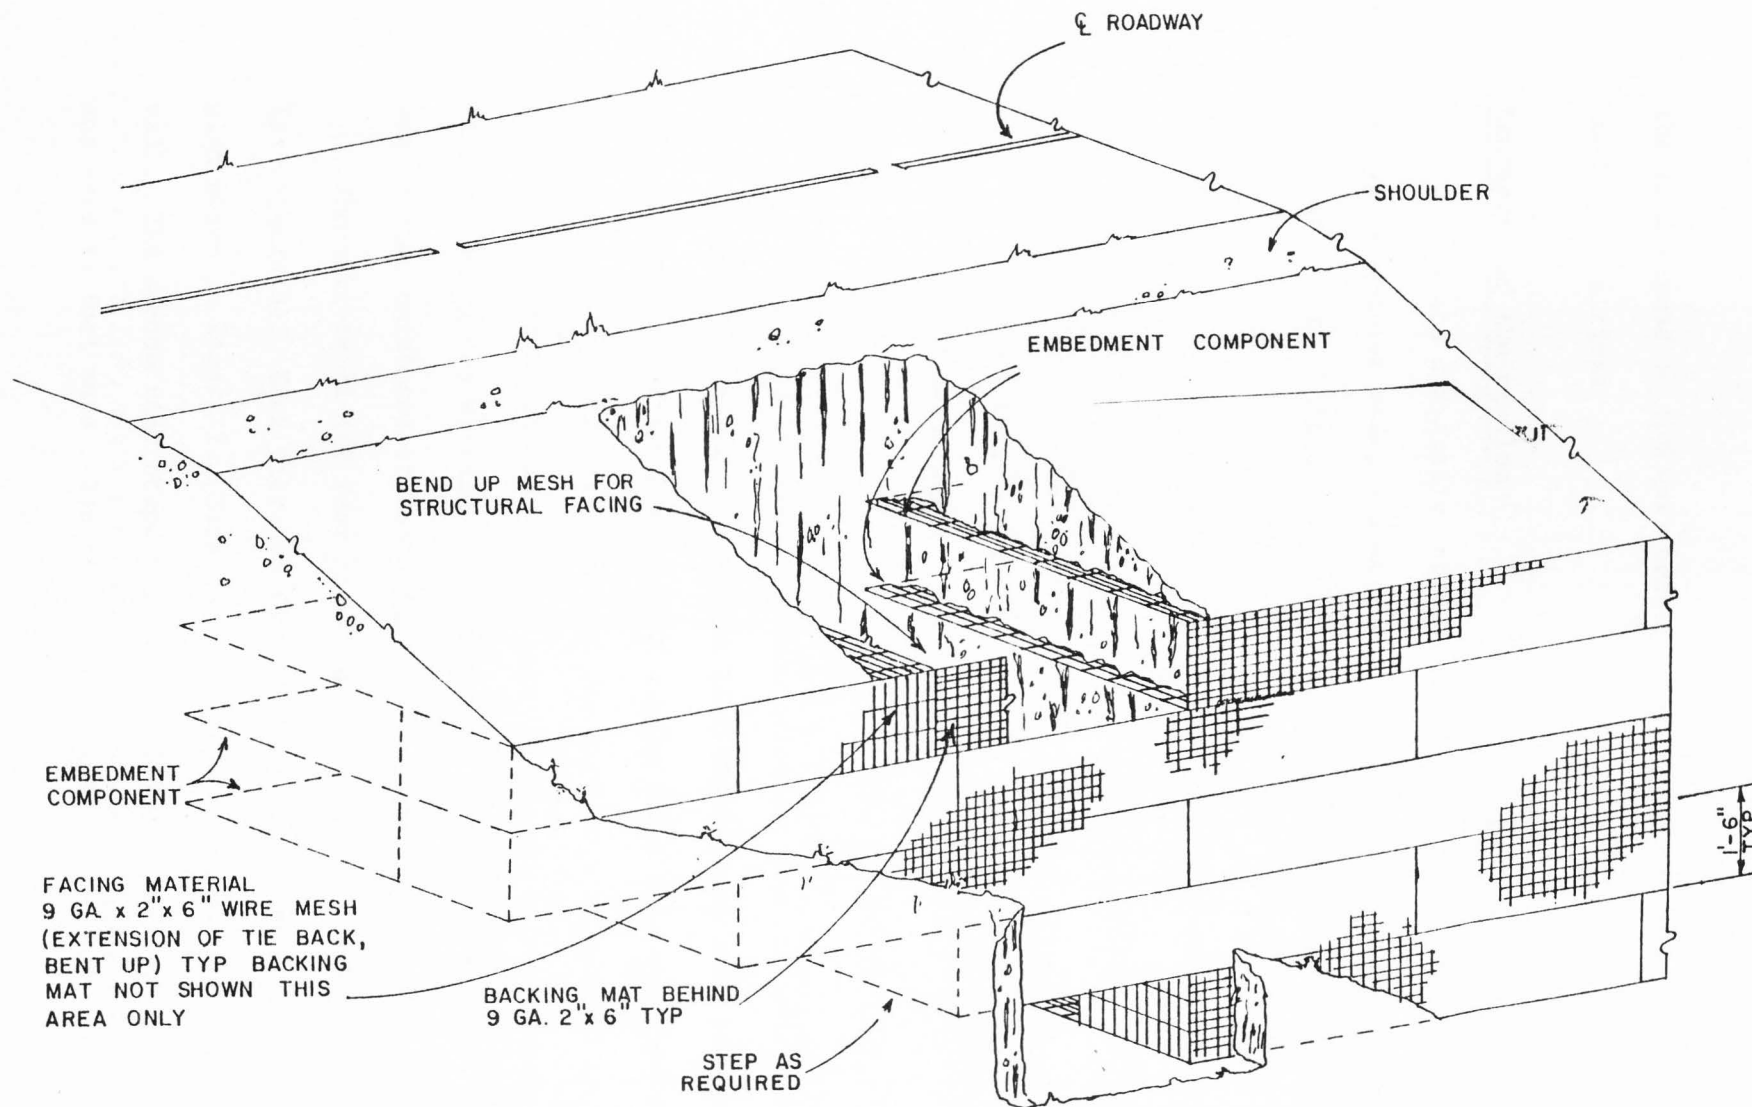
Welded wire wall: pictorial sketch showing general plan of construction.
